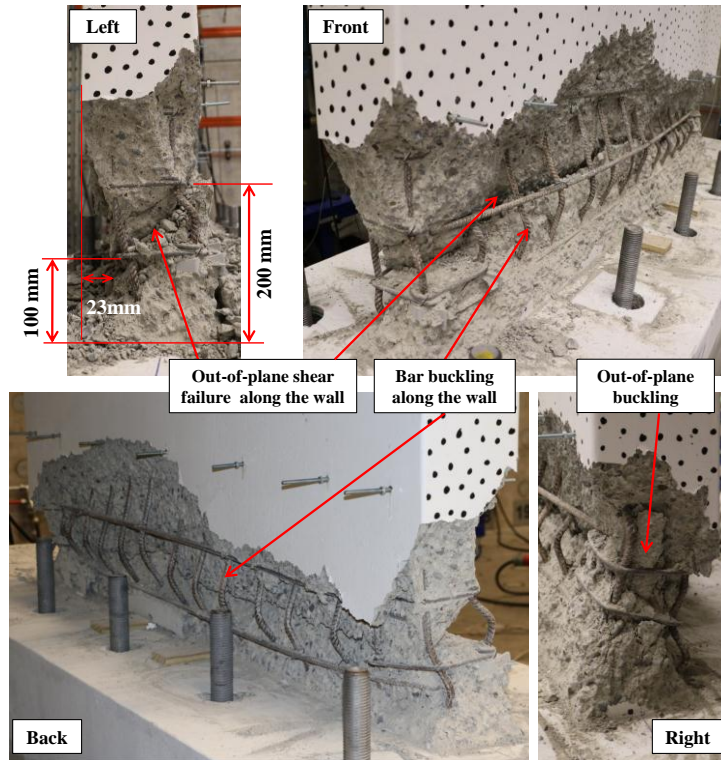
SP2-ND failure mode after removing the concrete spalling pieces
